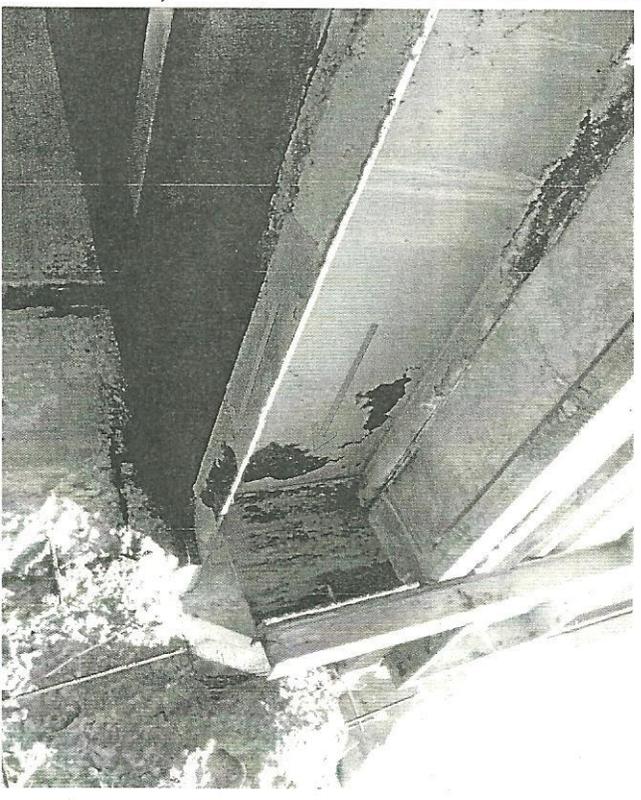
View of laminar rust at web & flange, fascia beam-5 south side.
